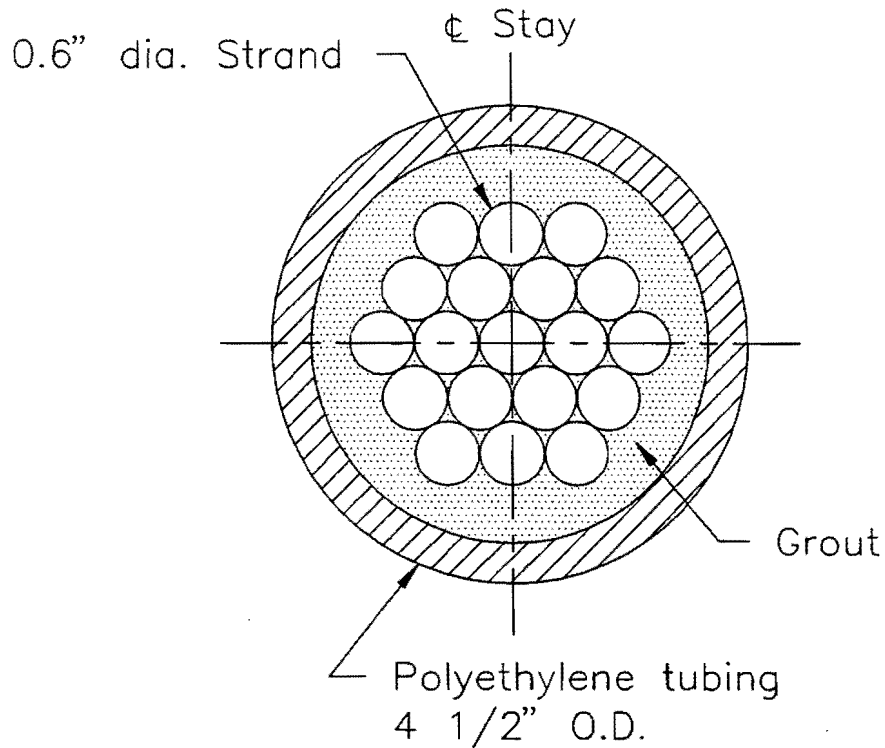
Cross section of cable stay specimen used in laboratory experiments.
